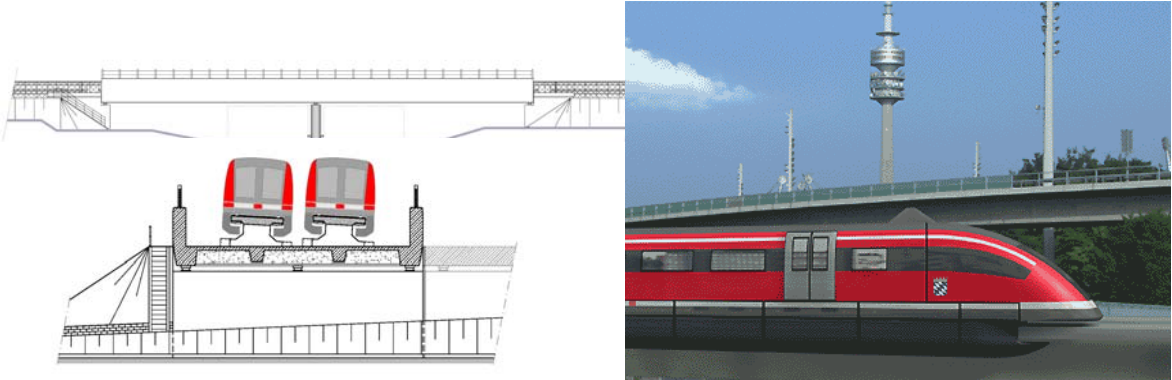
Urban bridge construction - e.g. Georg-Brauchle-Ring
